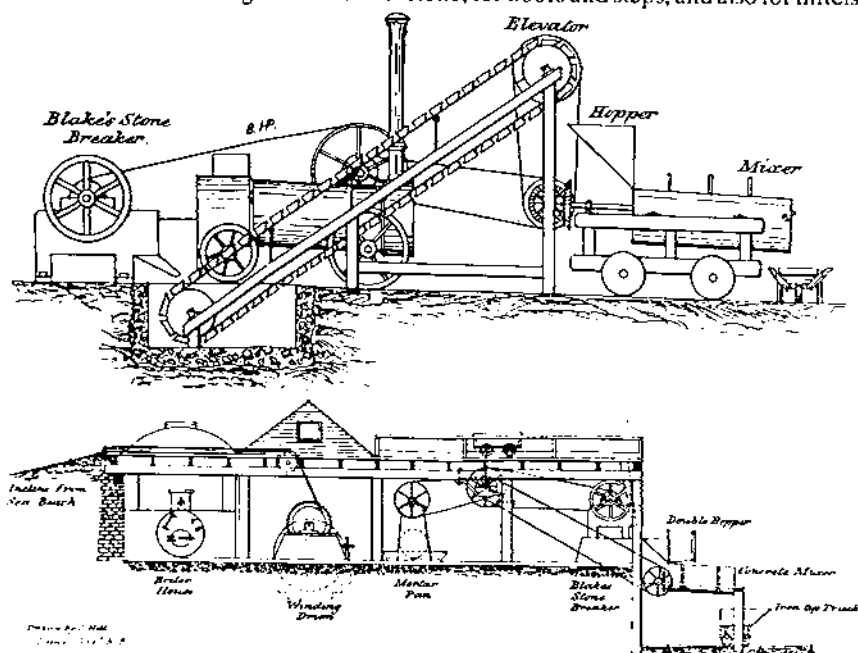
Mobile (top) and Static (bottom) Concrete Mixing Plant 1874
